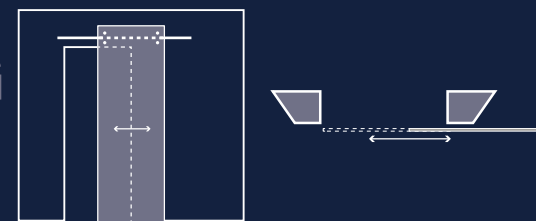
DETAILS OF VITRA EXTERNAL WALL SLIDING DOOR INSIDE
